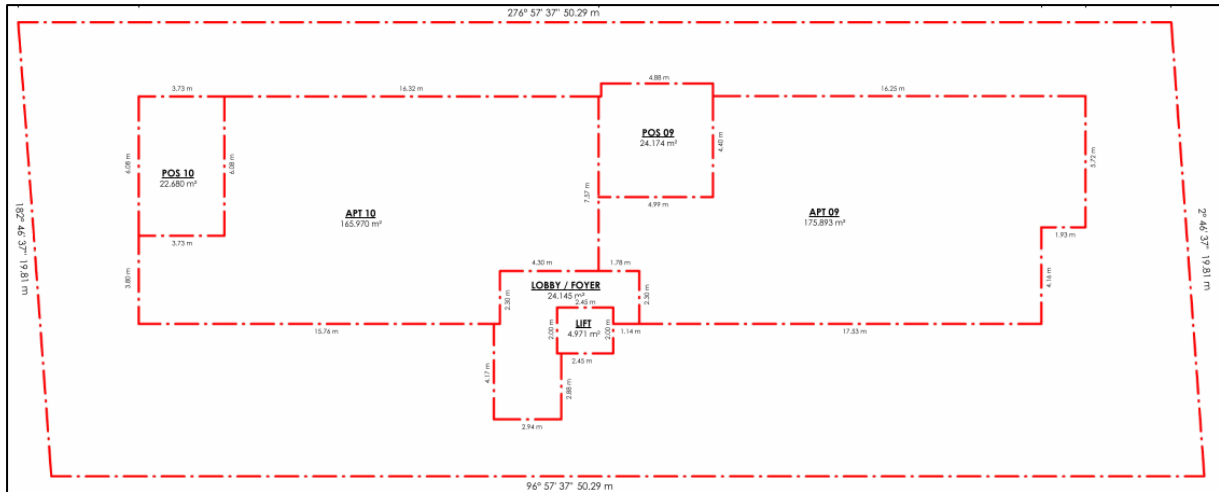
(Above) Proposed upper (second) floor plan of subdivision. Source: Application documents.
